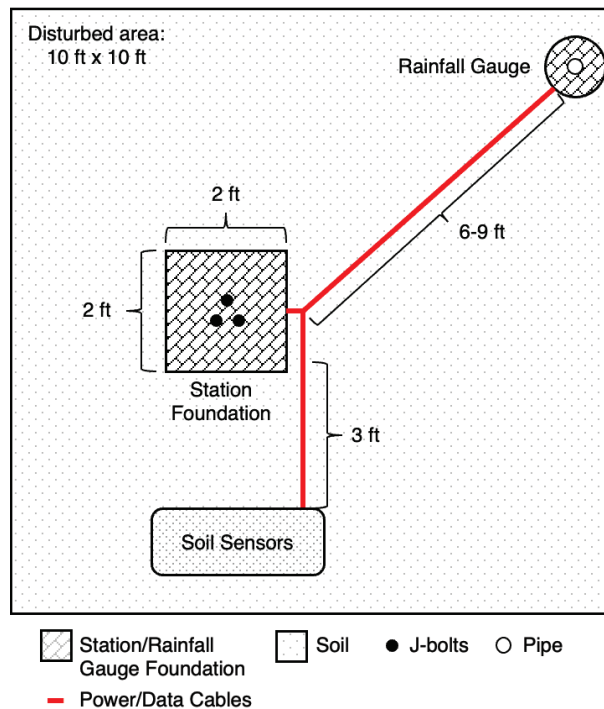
Schematic showing the layout of the proposed weather station mast and foundation, rainfall gauge and foundation, and soil sensor trench, as well as power and data cables routed between the sensors and the tower.
